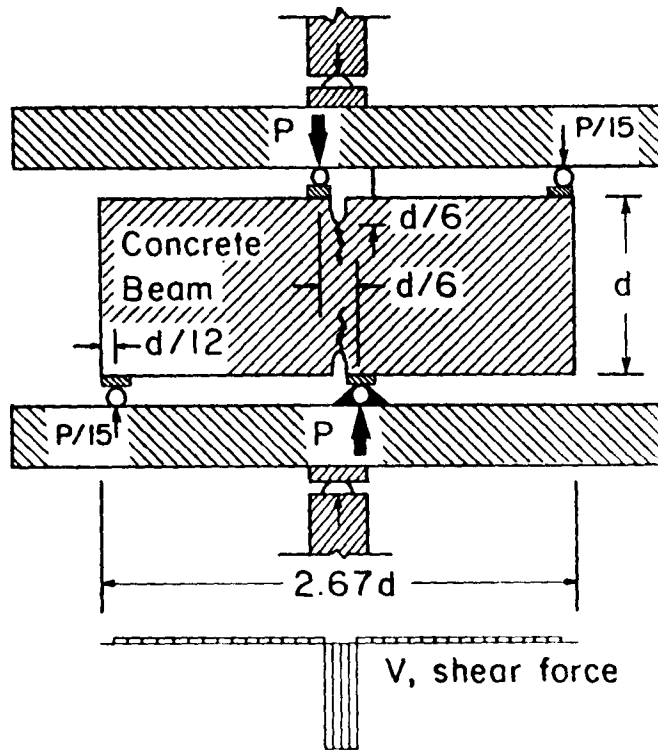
Mode II Fracture Specimen and Loading Apparatus.
